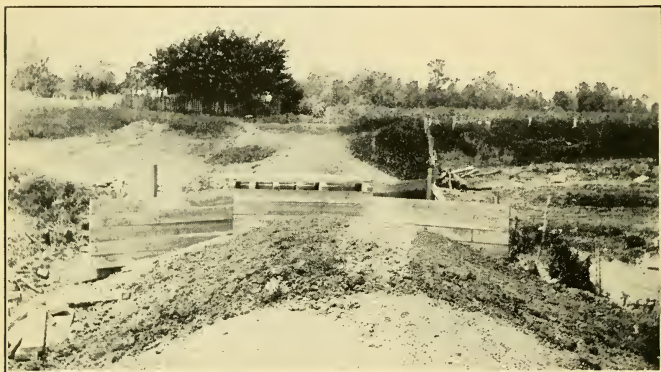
View across Bayou Walnut showing wing walls of spillway and bridge over spillway box.
